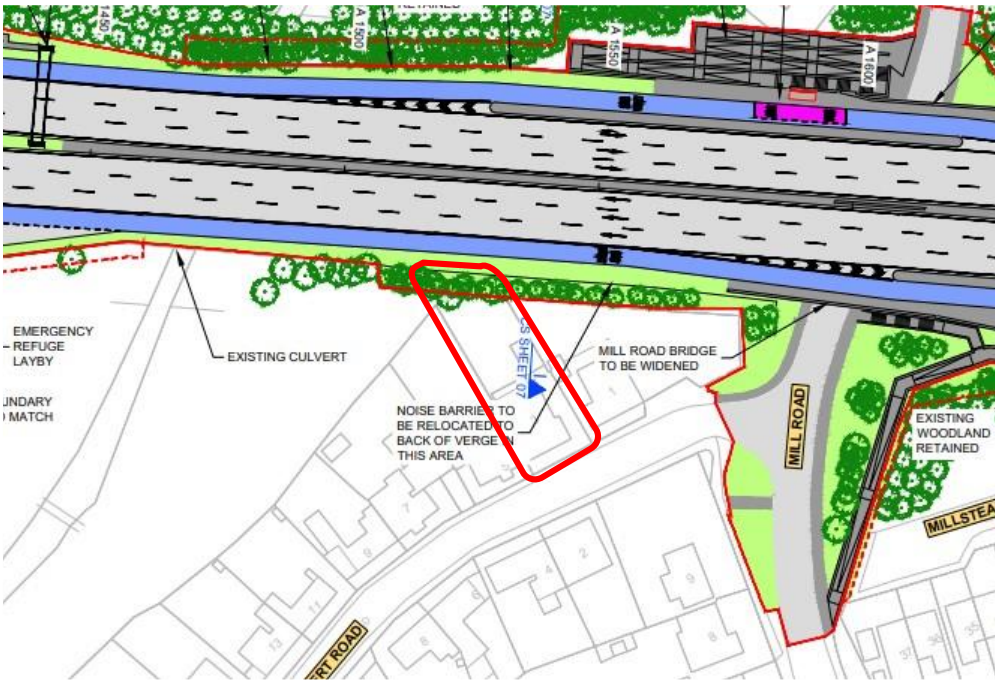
Proposed new Layout at 3 Herbert Road
